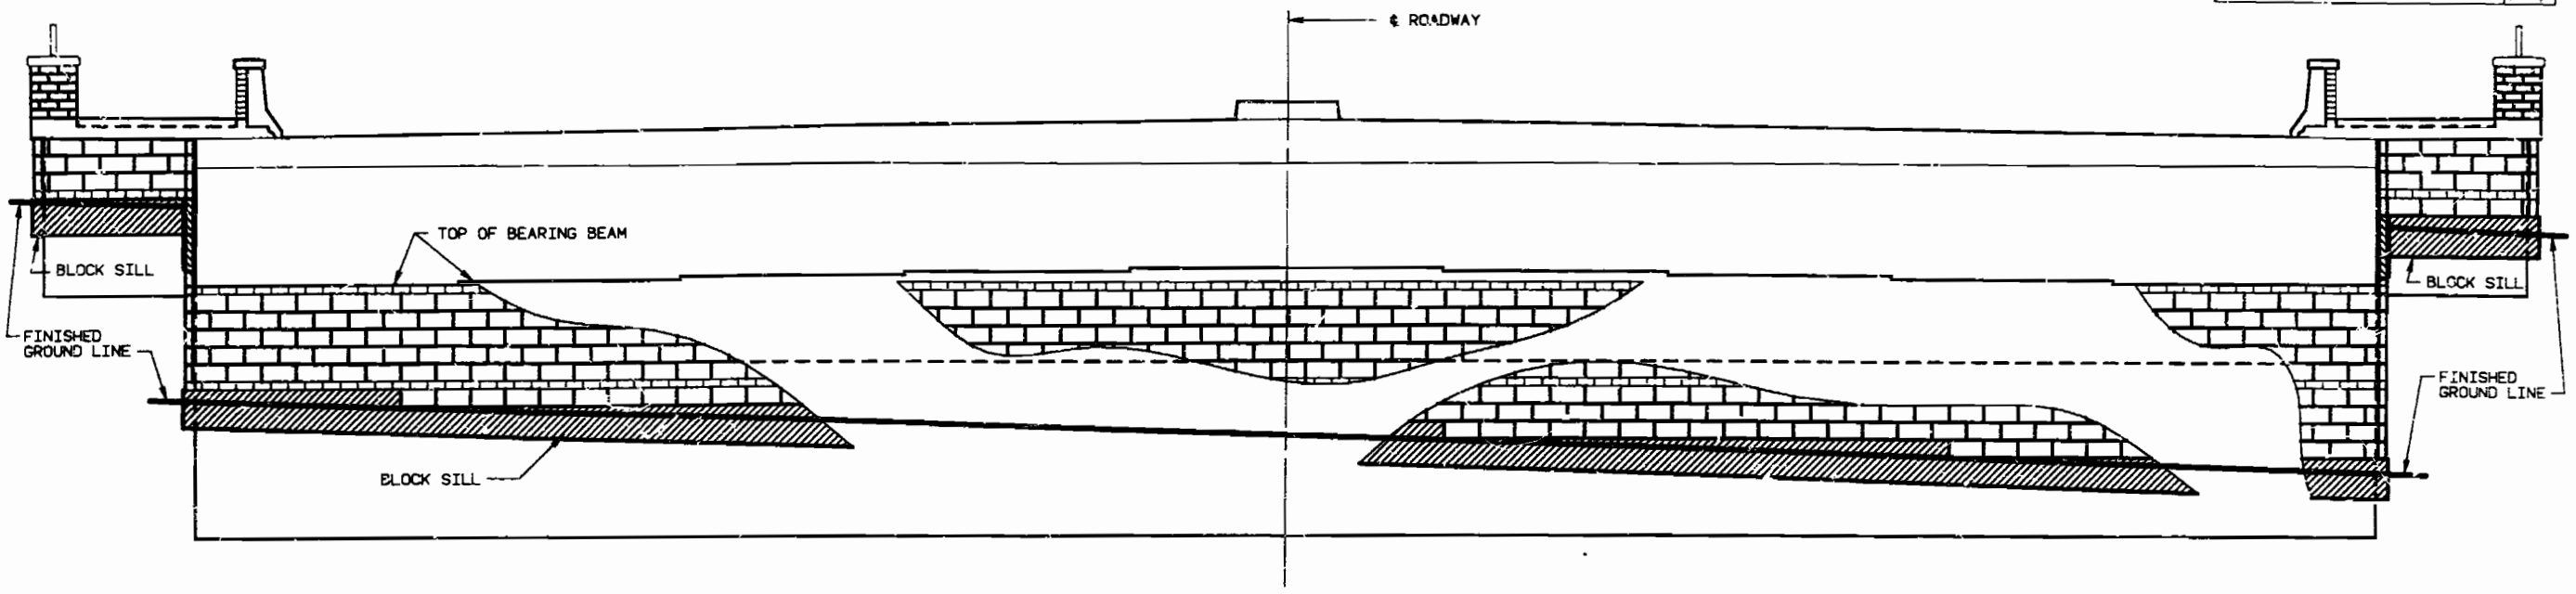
DETAILS OF BRIDGE ANCHOR SECTION ATTACHMENT
